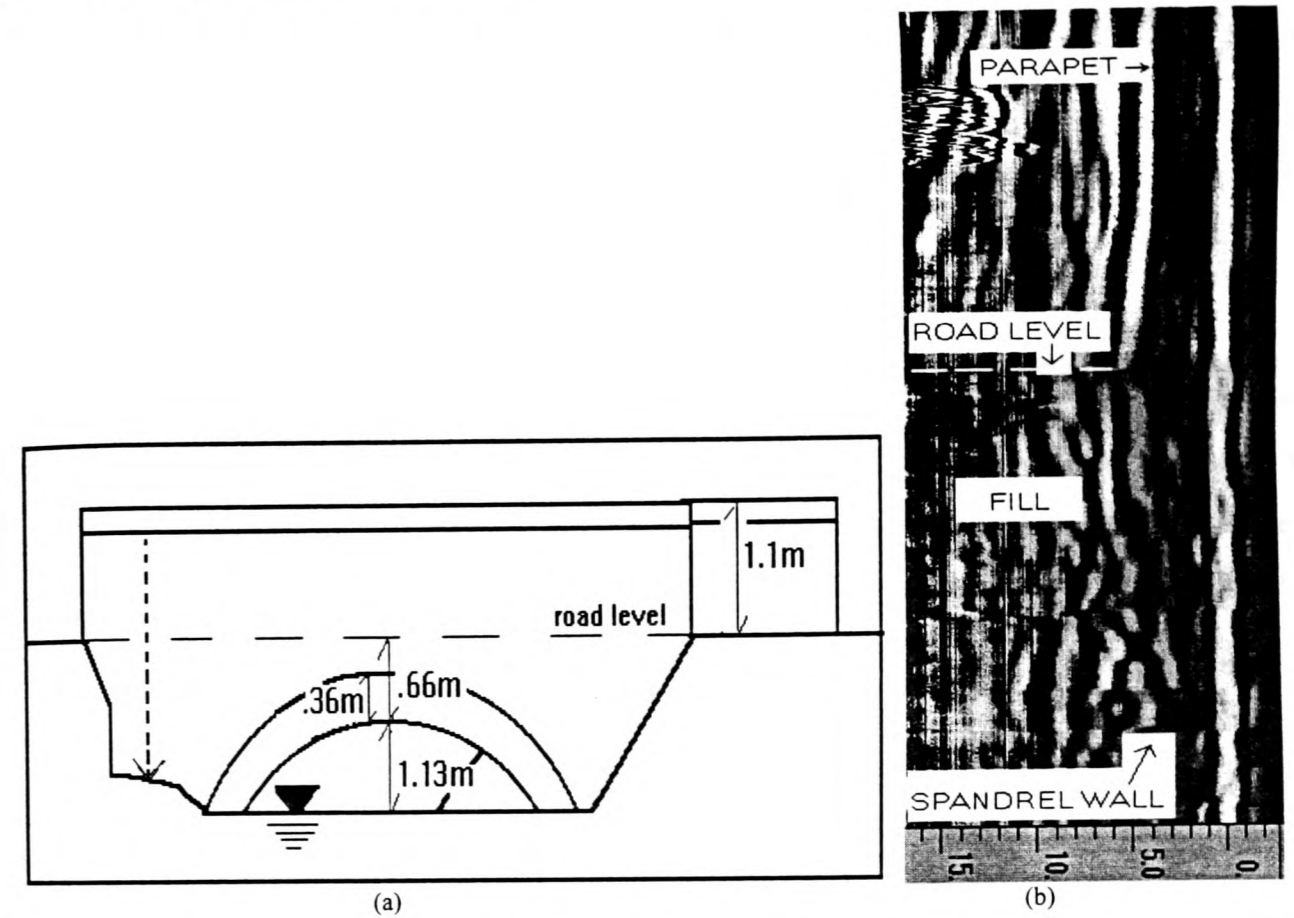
Kilbucho Bridge: a) upstream elevation (dotted vertical line marks position and direction of scanning); b) radar vertical section through parapet and spandrel wall.
